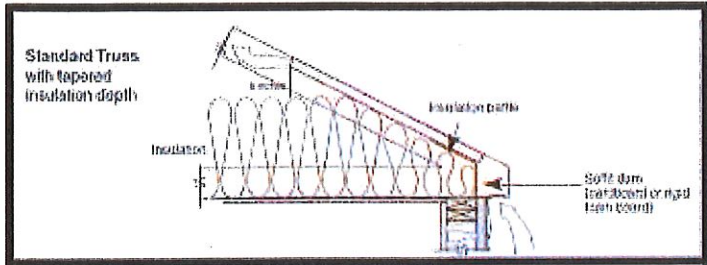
Standard truss with attic space. Source: [Attic Eave Minimum Insulation | Building America Solution Center \(bnrl.gov\)](#)
